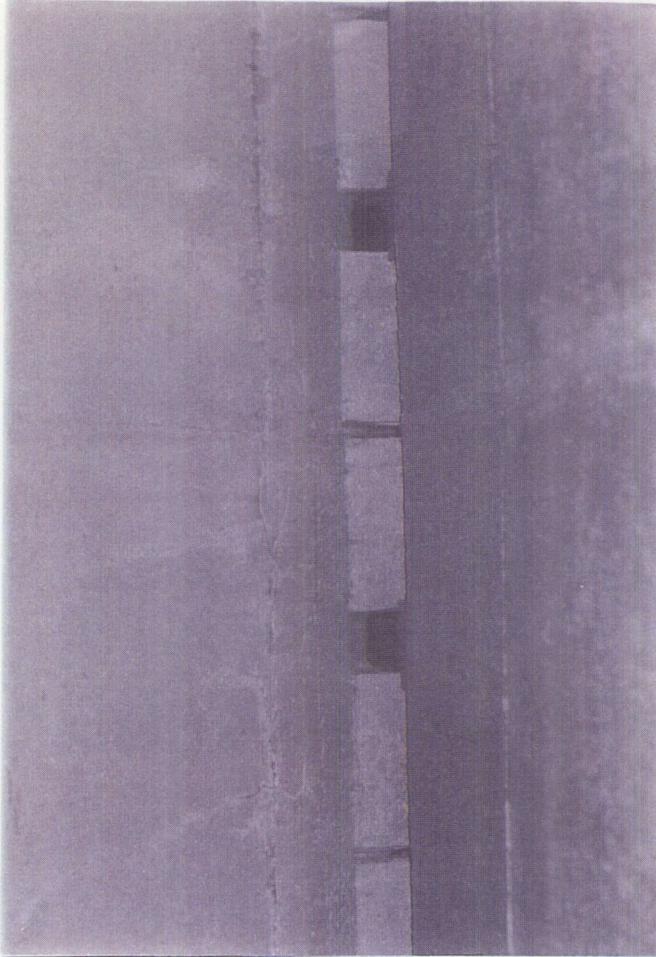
Morris Dam - 70' x 18.' Drum Gate #3 - Downstream side of gate chamber. Looking up towards gate hinges. Photo right is bottom faceplate. Photo left is concrete downstream gate chamber. - (9/10/98).
